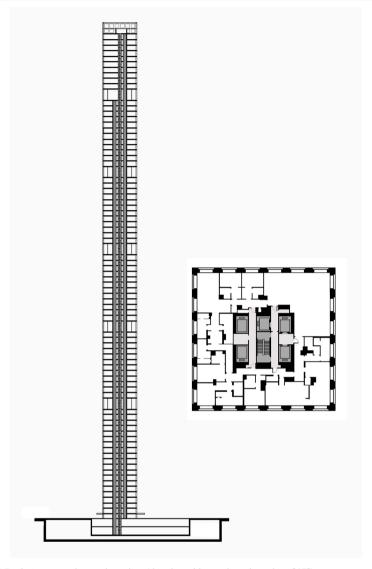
432 Park Avenue: plan and section (developed by authors based on [47])
